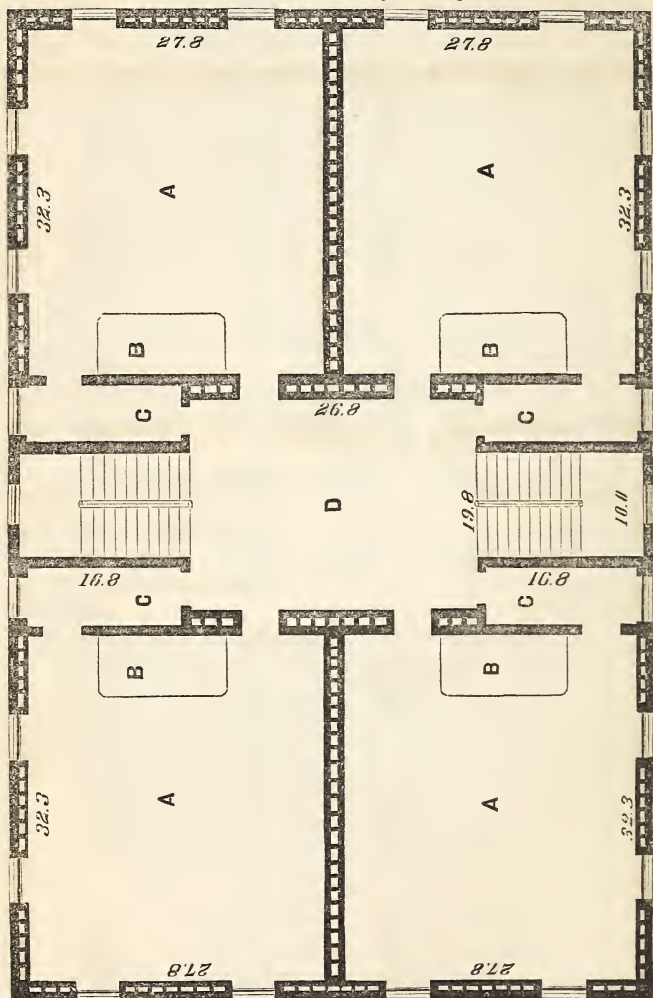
PLAN OF FIRST, SECOND AND THIRD FLOORS.
